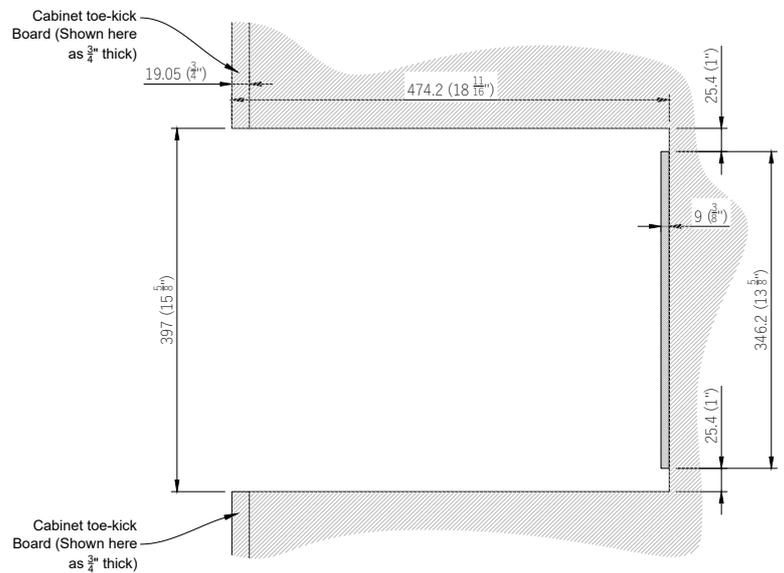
EZ-Drawer Minimum Rough Opening Dimensions
